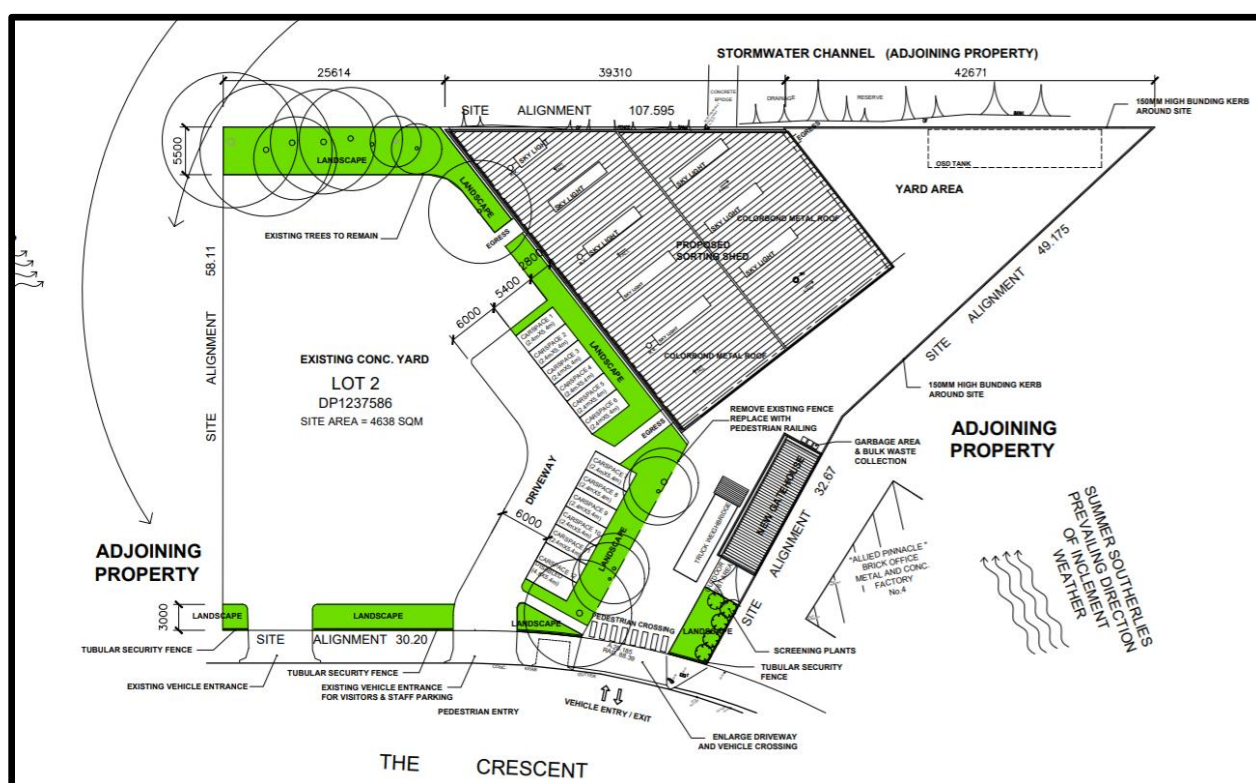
Proposed site plan and layout of buildings and proposed structures (courtesy: Robert Lee Architects, 2019)
